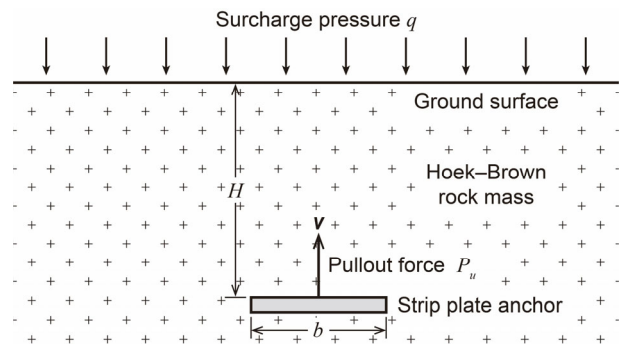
Strip plate anchor embedded in a shallow rock mass.
